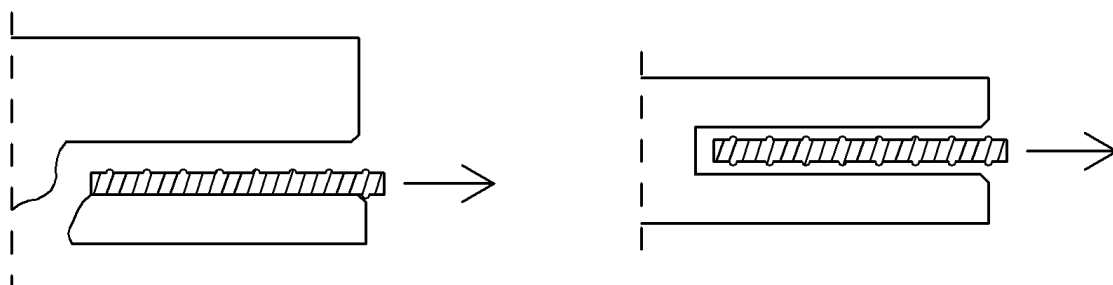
Examples of anchorage failure, to the left; splitting failure and to the right; pull-out failure
